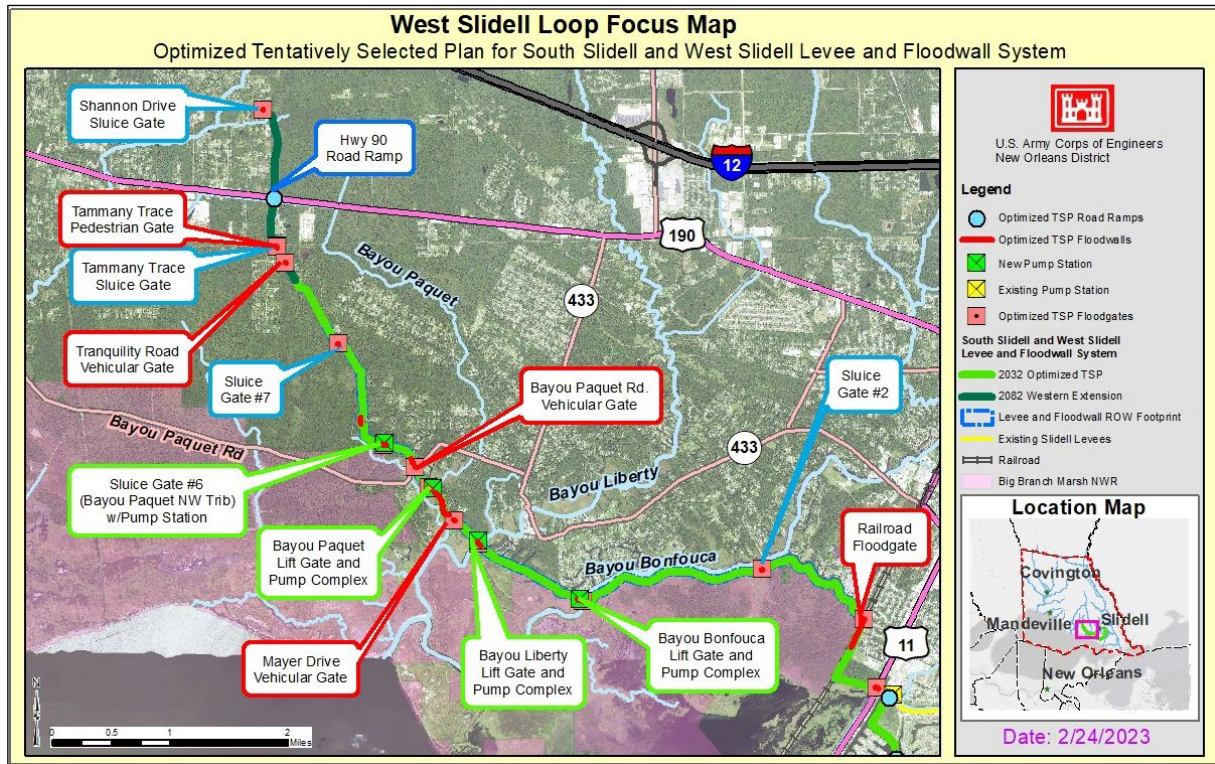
From Appendix D: Engineering Figure D:10-4 West Slidell Levee and Floodwall System – Optimized Tentatively Selected Plan Focus with Structures
